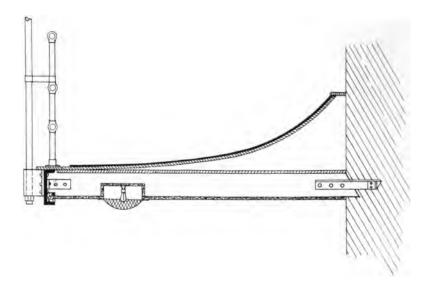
Typical Track Section. Note space between supporting rod and railing; also recessed under-gallery light.
